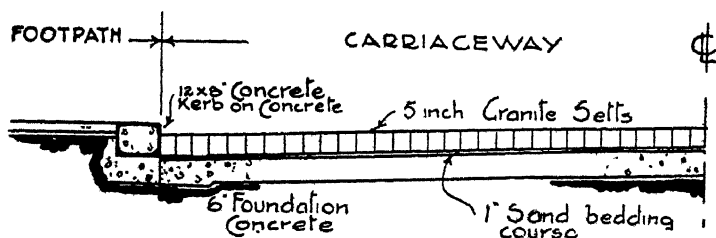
GRANITE CUBE SETTS ON CONCRETE FOUNDATION.
